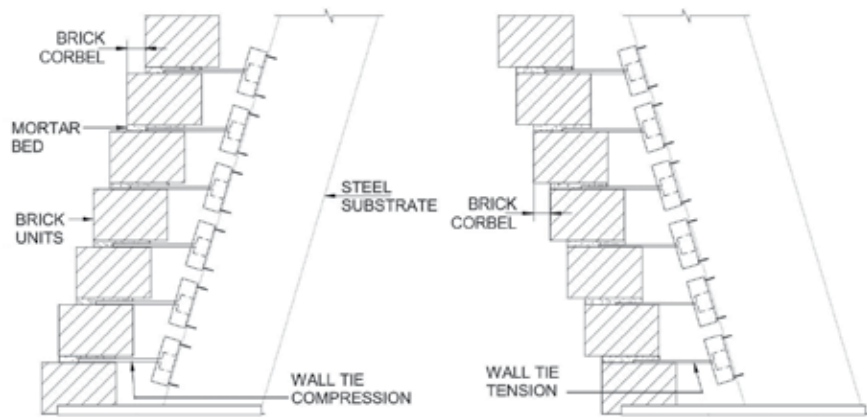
Brick ties in compression when the wall leans in (left) and ties in tension when the wall leans out (right).
